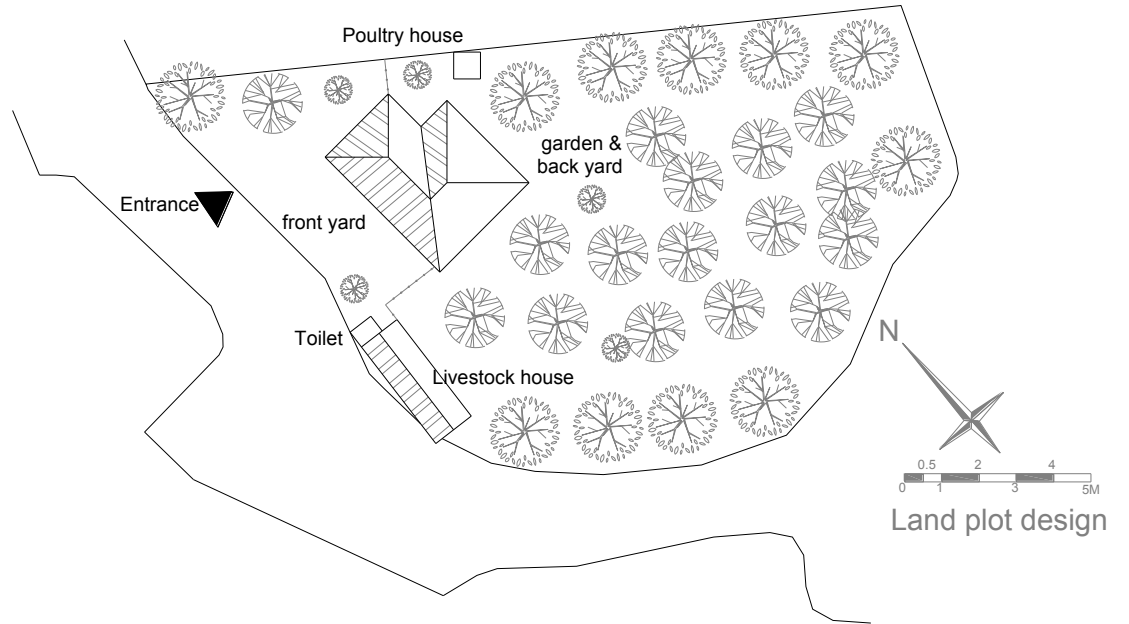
Land plot design on a sloped land of the new house in Perija defining the location of the house, outbuildings, entrance into the land, and location of open spaces.
